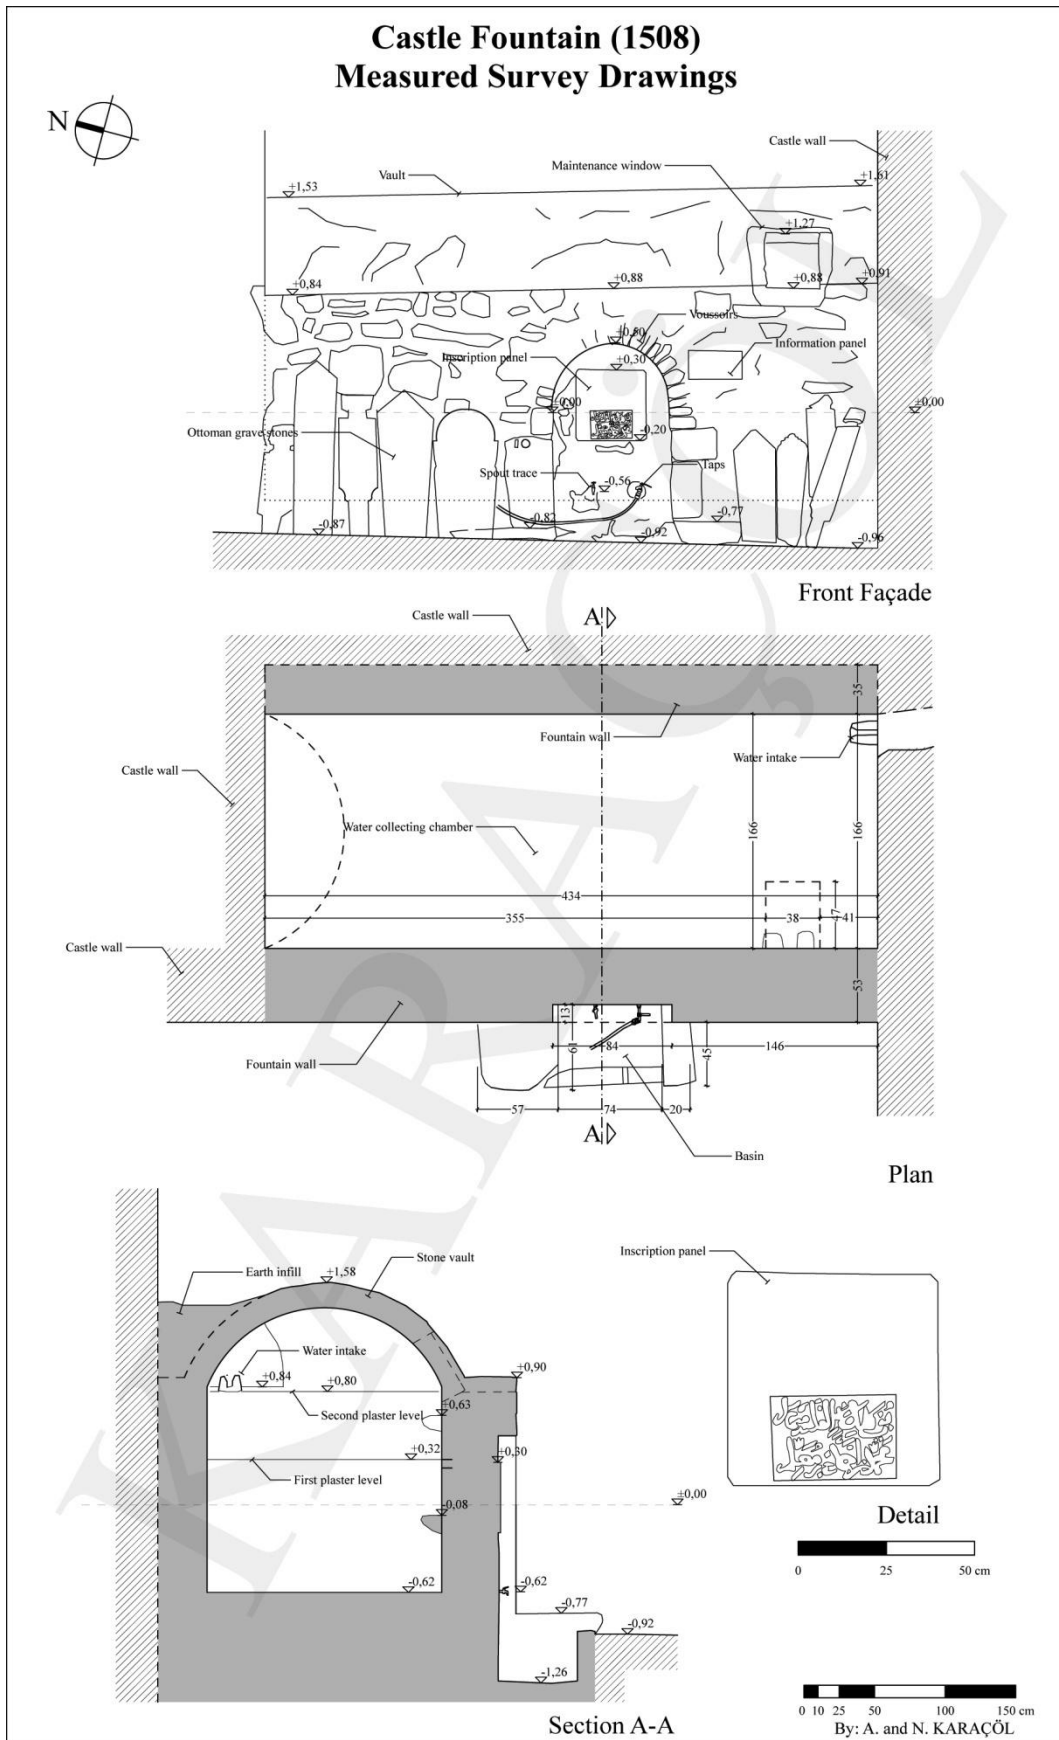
Castle Fountain front façade, plan, section and detail drawings
